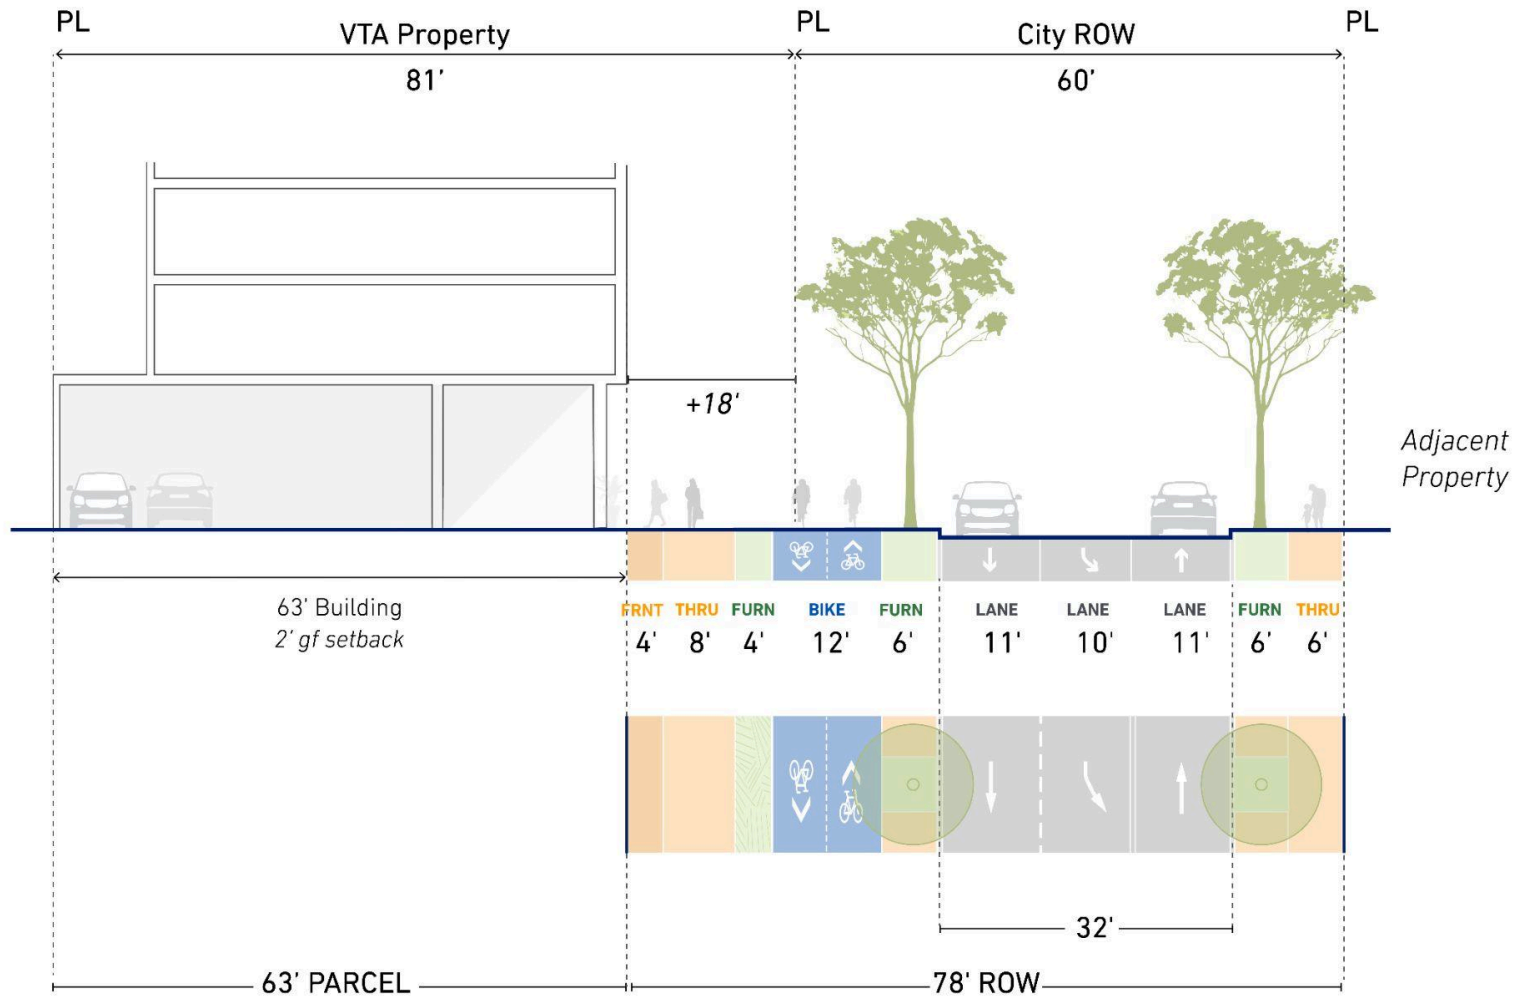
Conceptual N. 28th Street section #1 near E. Julian Street with separated sidewalk and bikeway (section 1)
